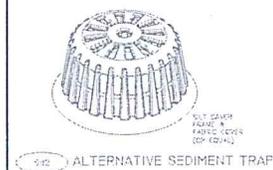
ALTERNATIVE SEDIMENT TRAP
